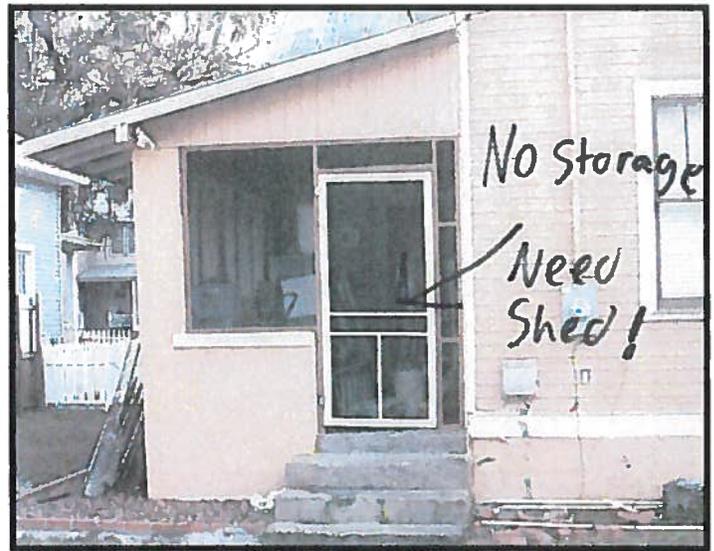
Rear porch – to be enclosed, new window left of door, door replaced with new front door type
